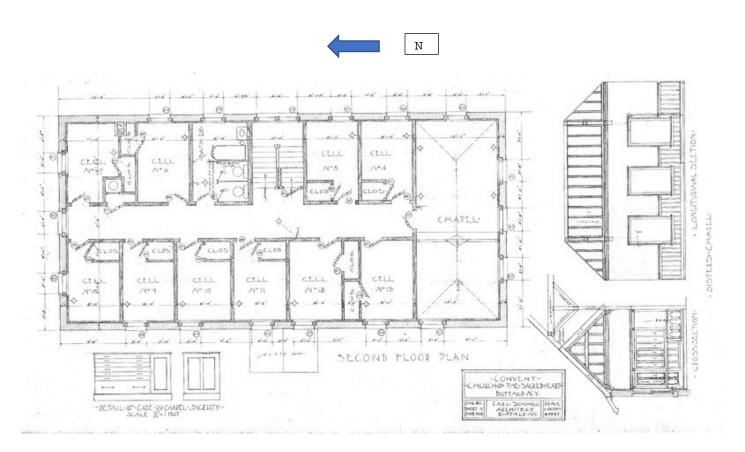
Second Floor Plan and Sections, Convent, Church of the Sacred Heart (1913)
